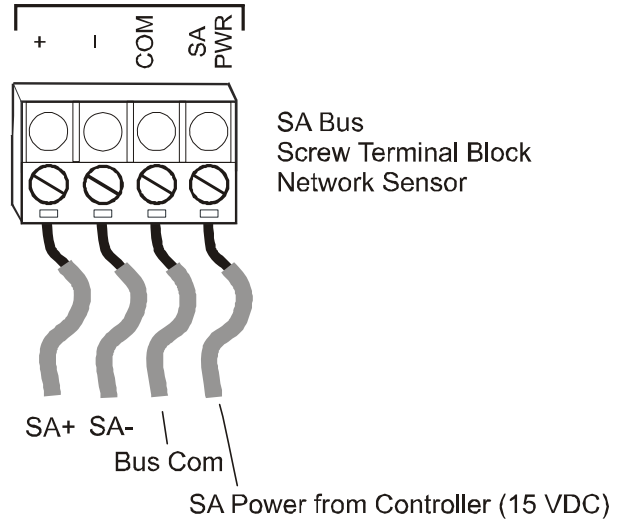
WIRING TO THE SCREW TERMINAL BLOCK
